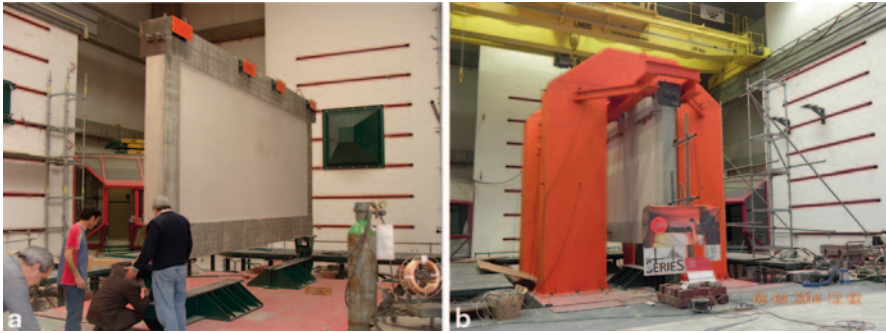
Wall panels test setup a Hinged base and pyramidal support, b complete setup
